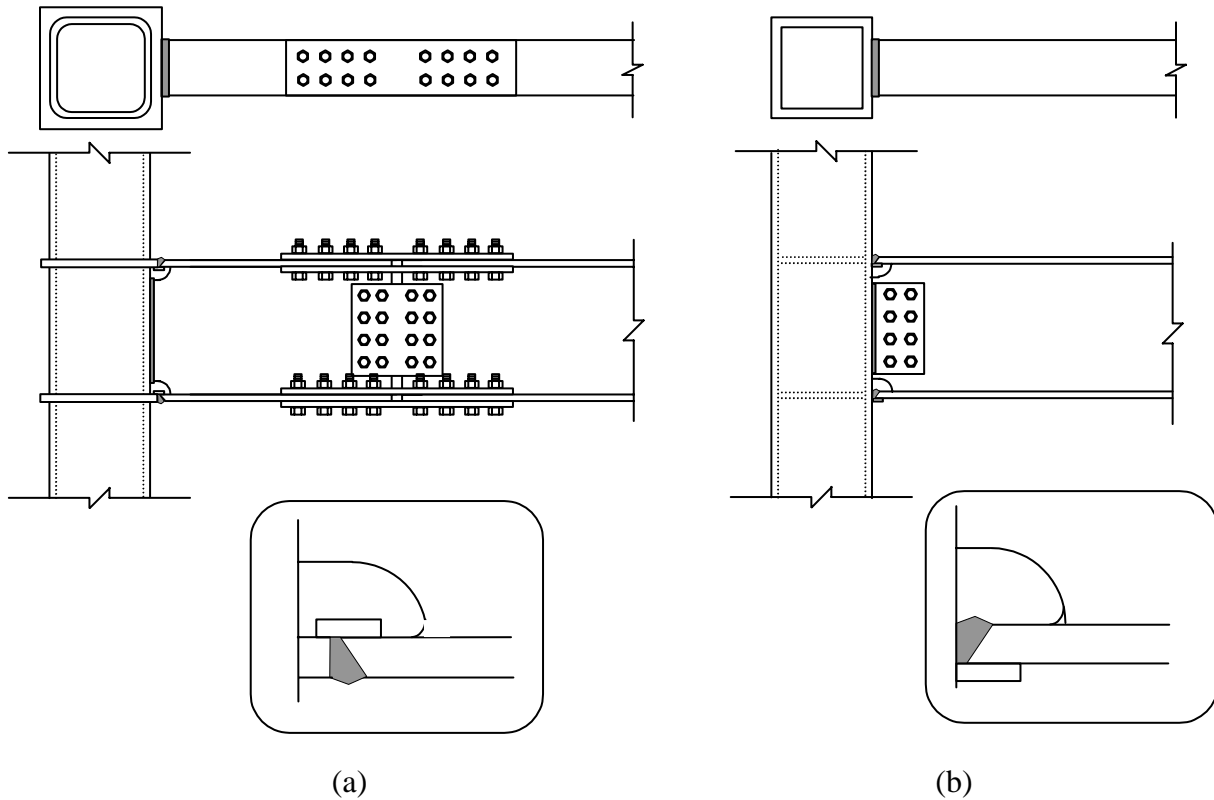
Types of Beam-to-Column Connections Popular in Japan; (a) Through-Diaphragm Connection; (b) Interior-Diaphragm Connection
